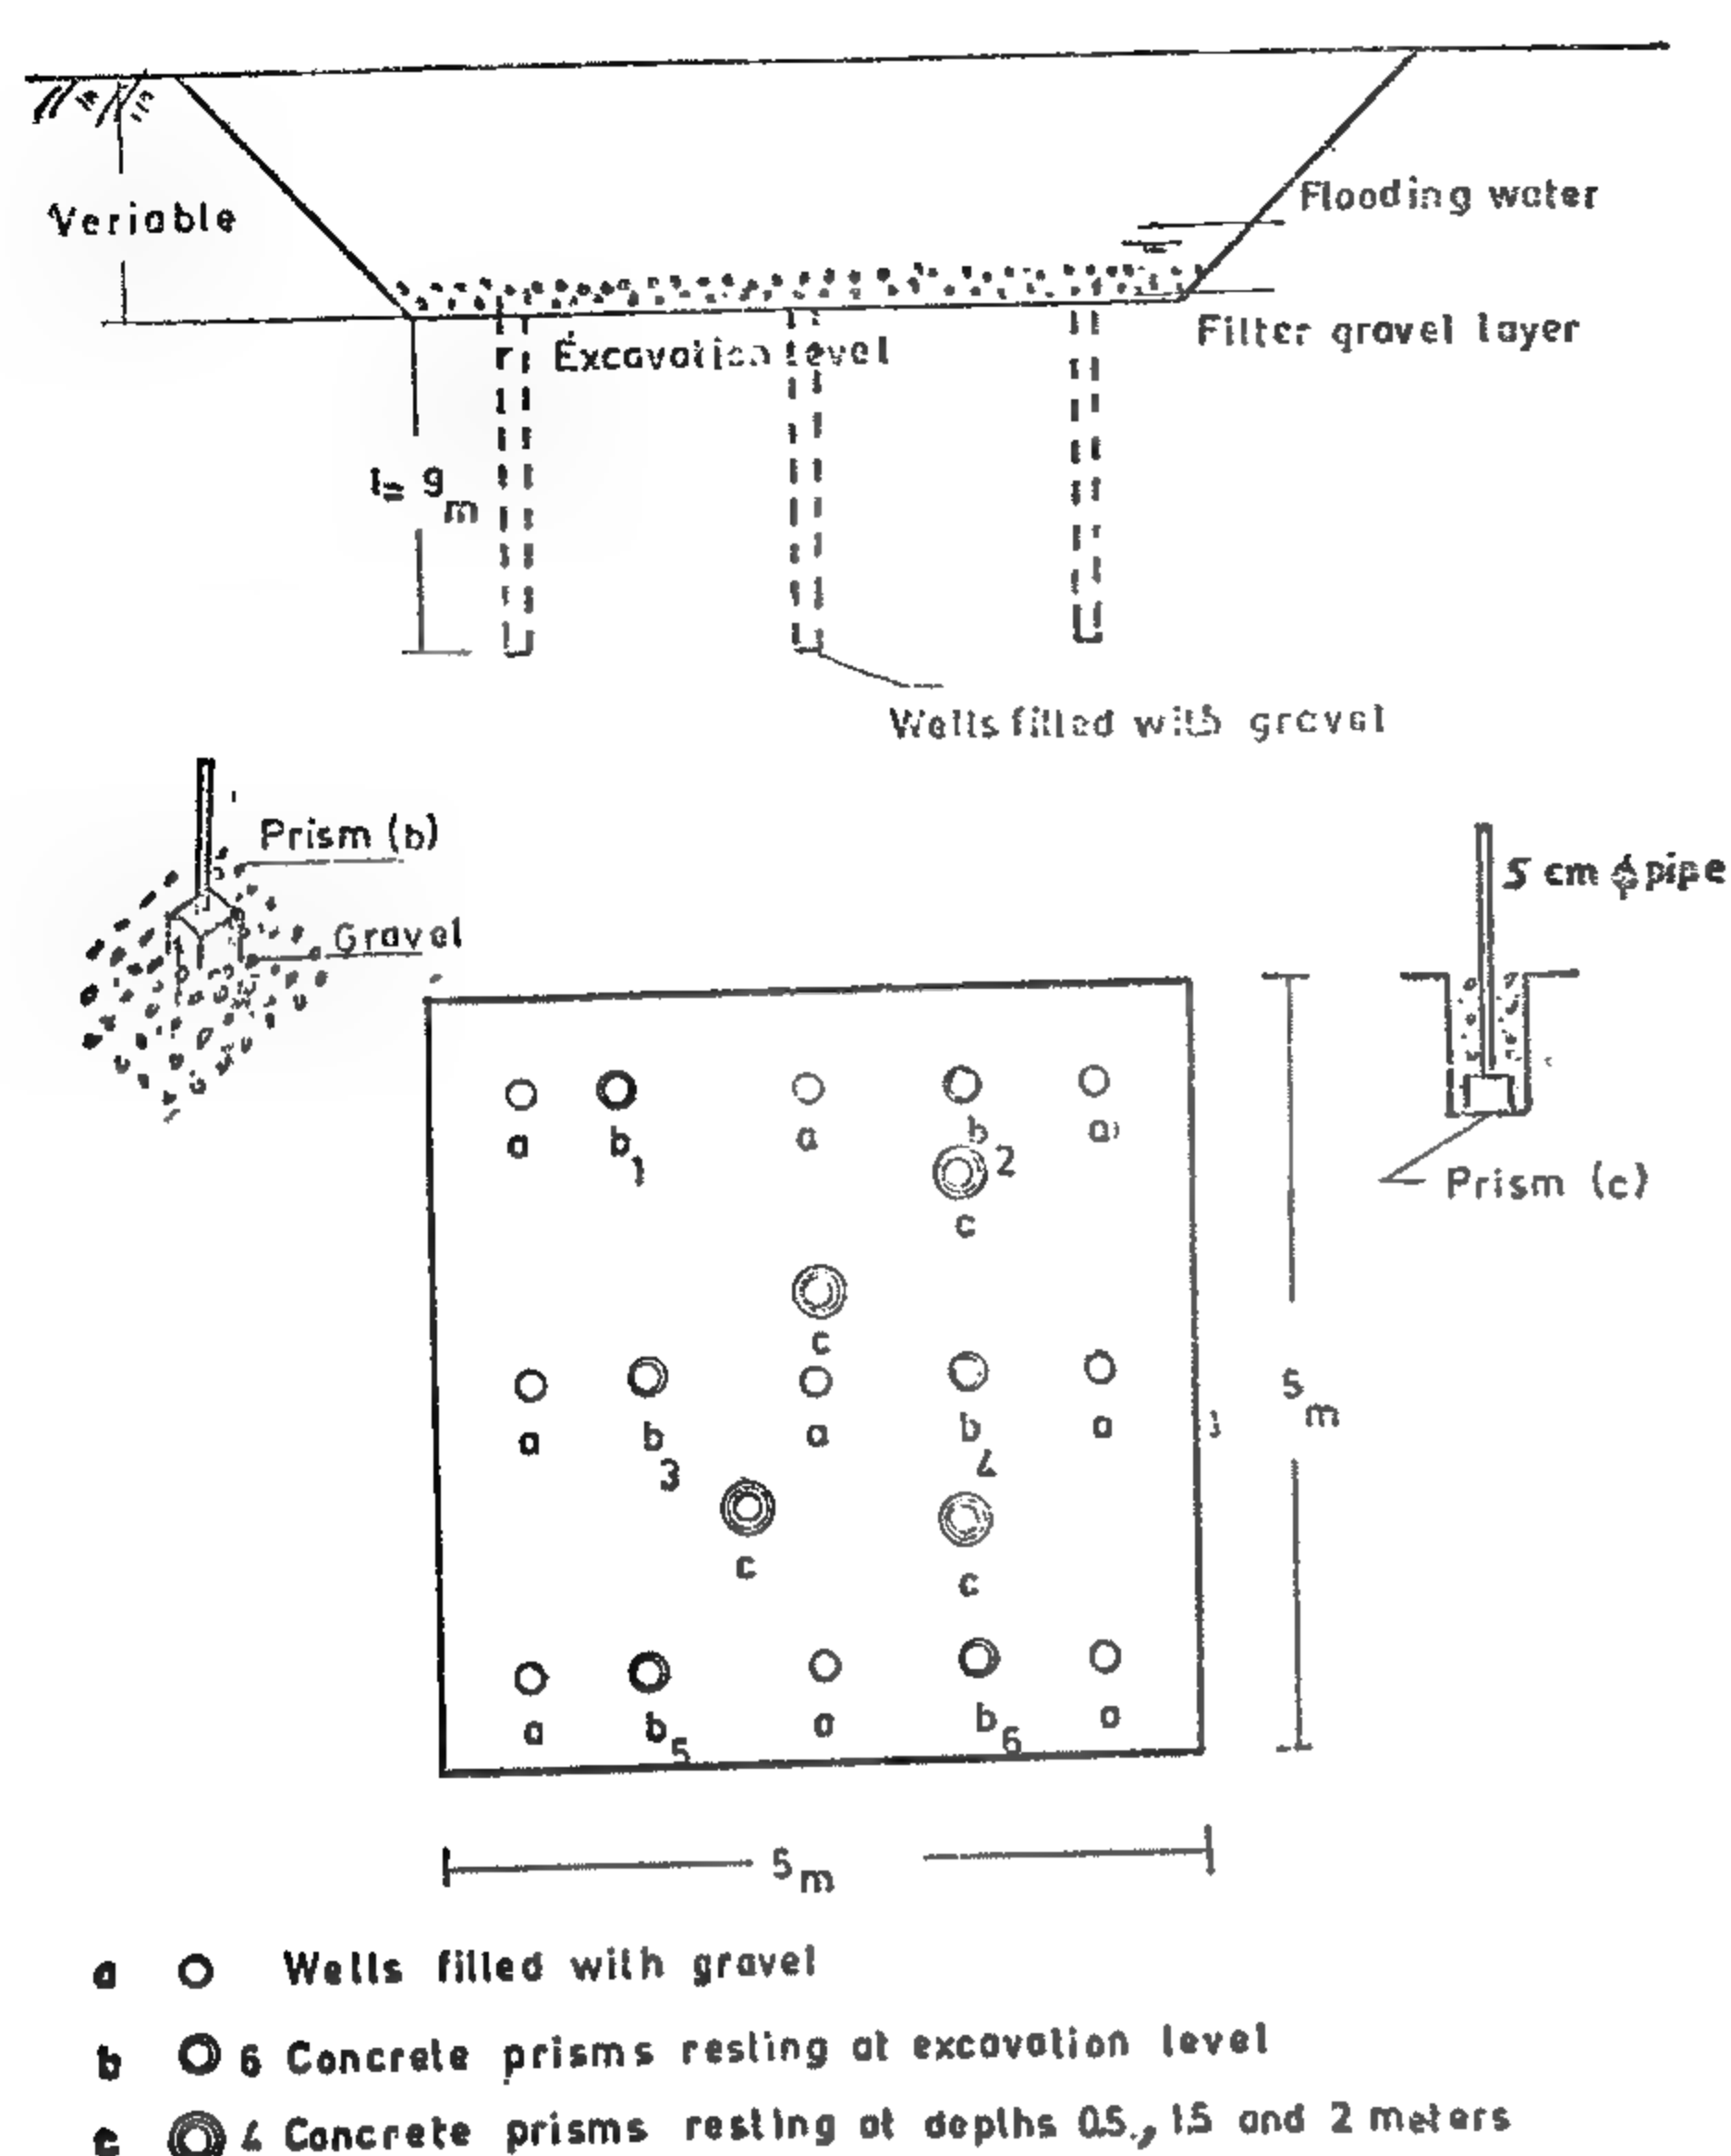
ARRANGEMENT OF CONCRETE PRISMS
